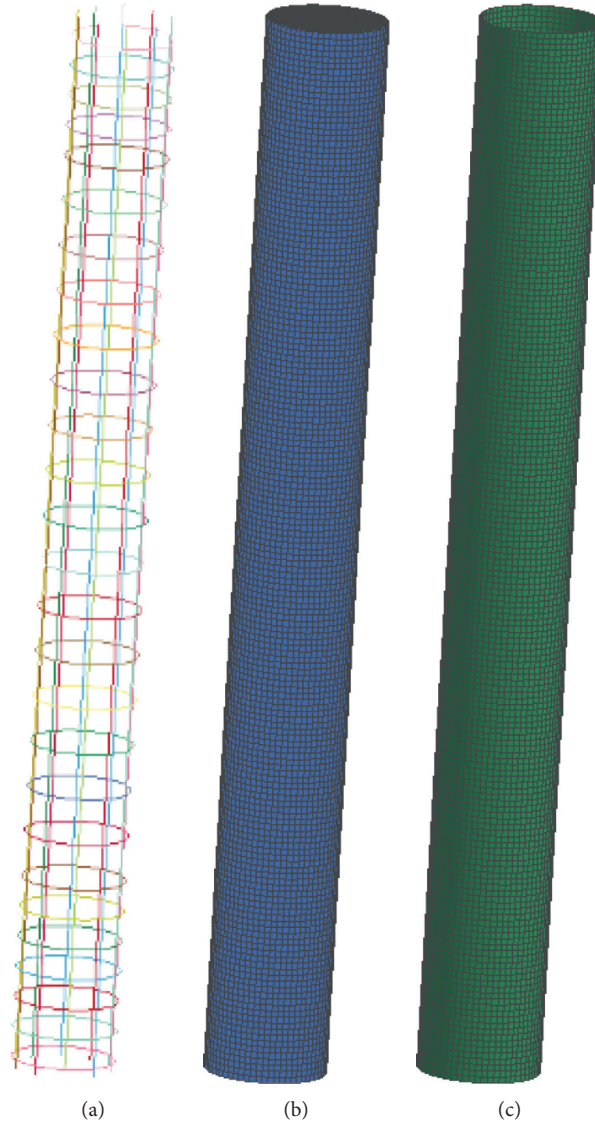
Finite element model of tested column. (a) Rebar. (b) Concrete. (c) FRP.
